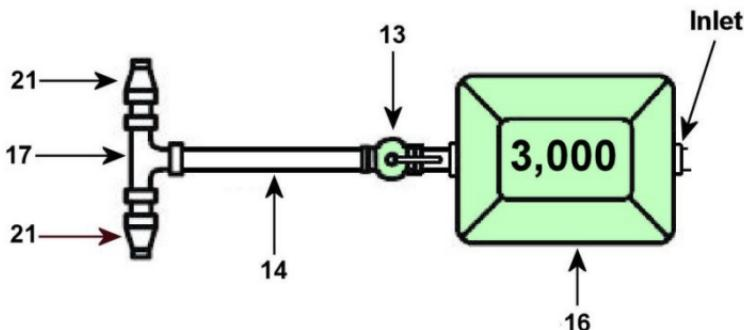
3,000-Gallon Tank Outlet Connections (Laundry).
